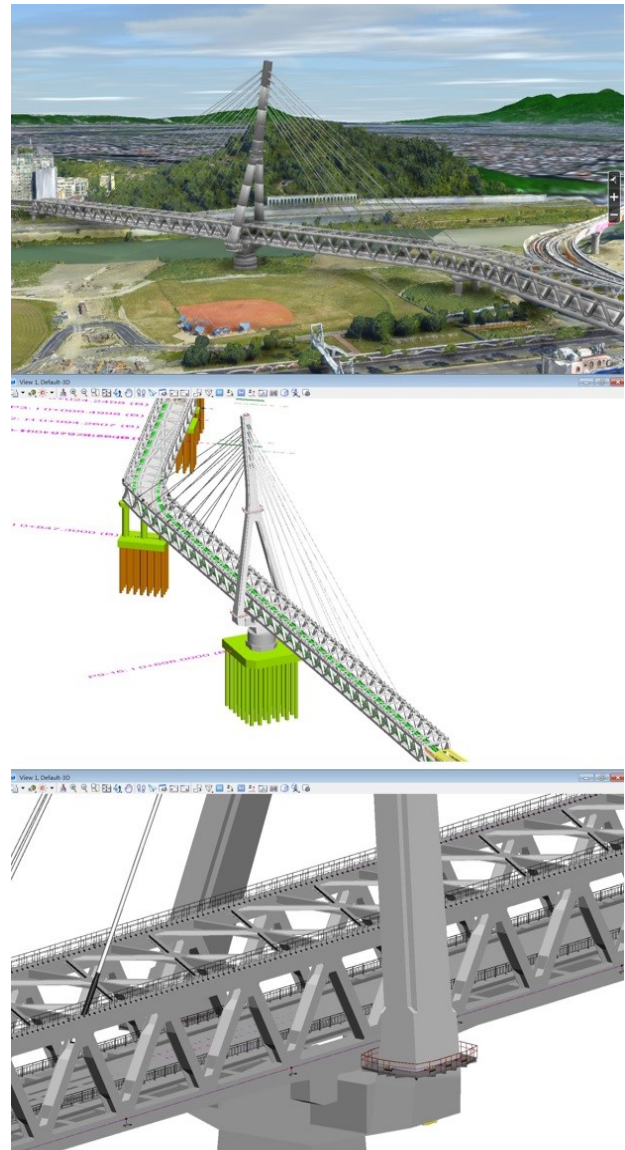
BIM output for the steel truss frame of the Anhsin Bridge.
